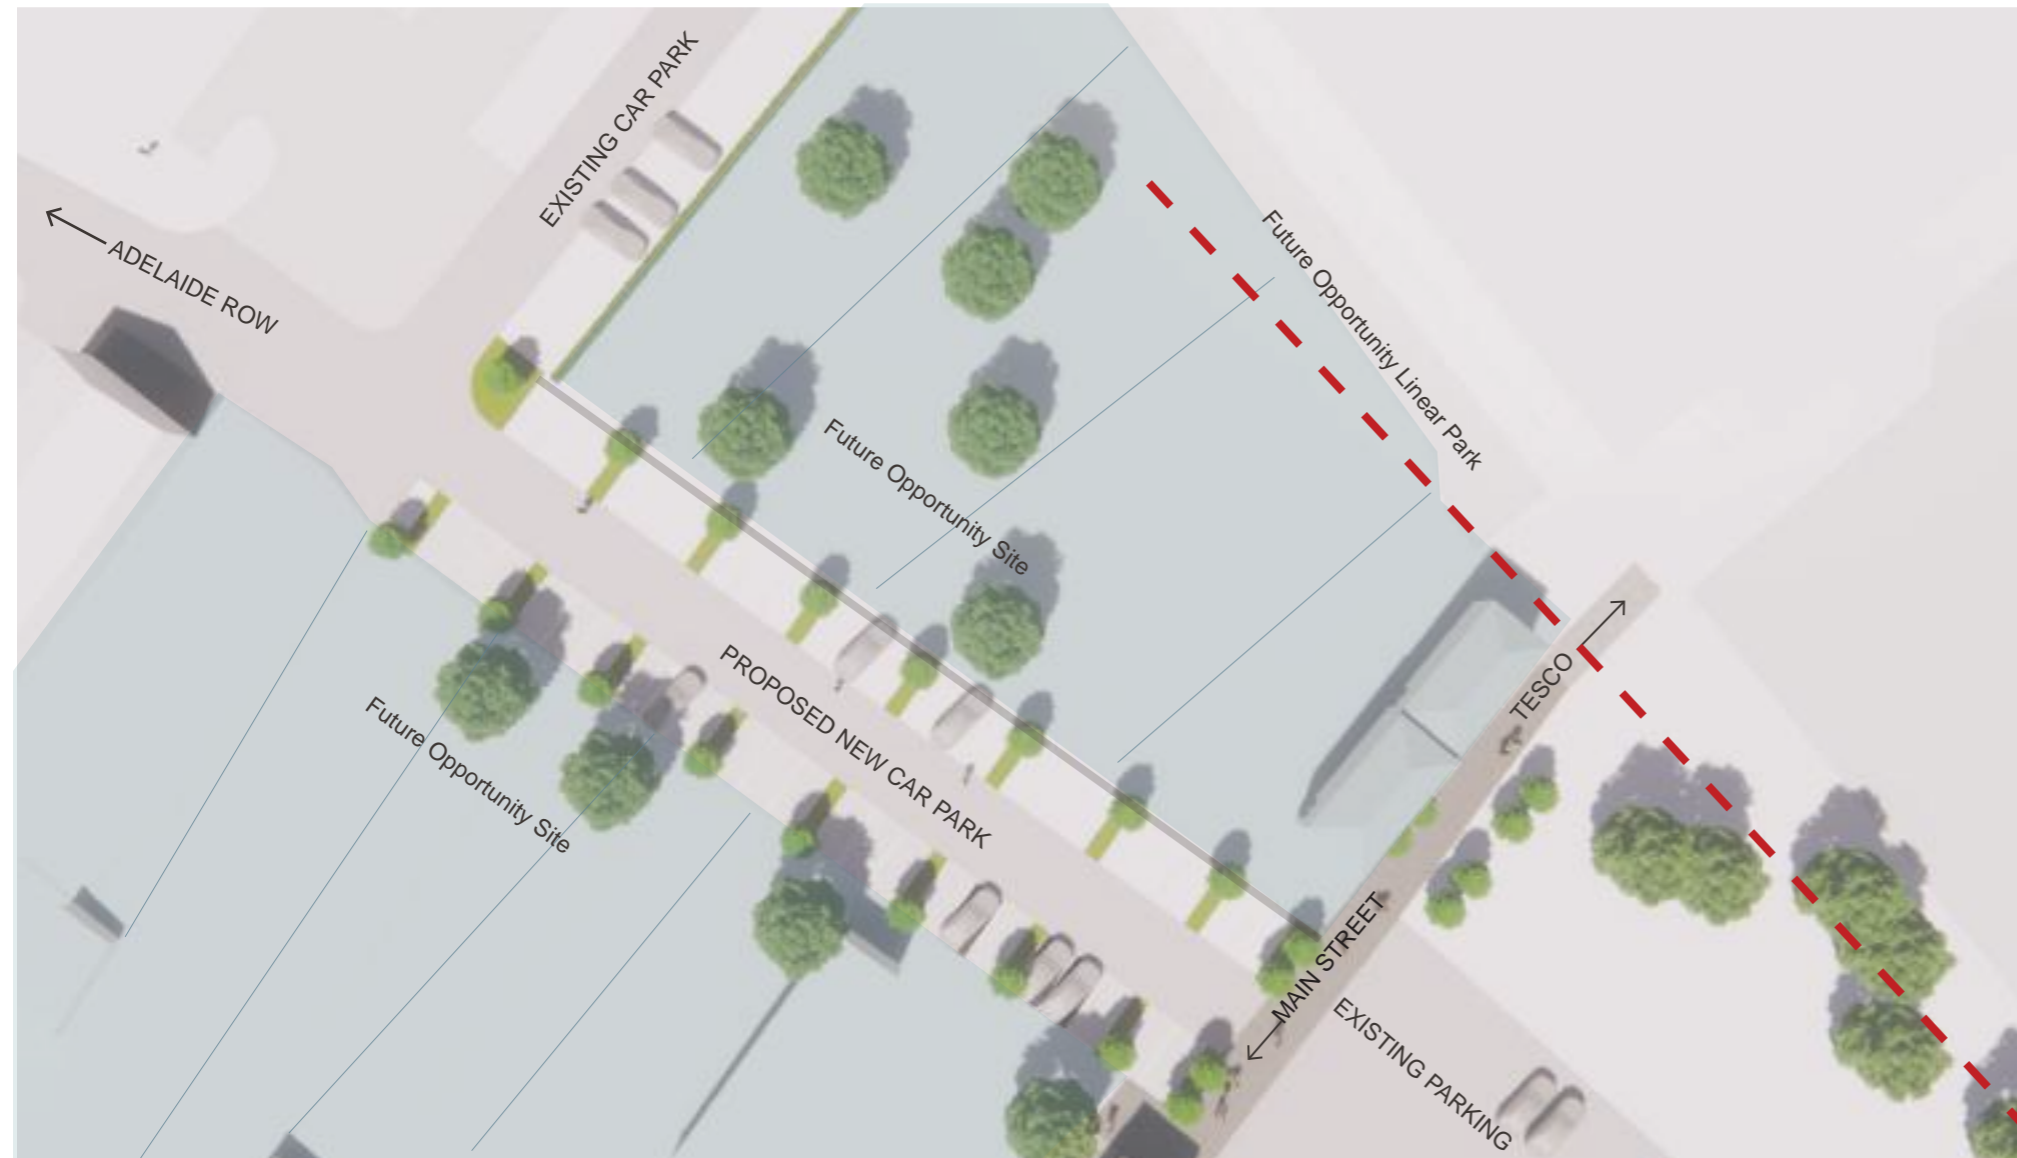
Artistic Impression of Proposed New Car Park - Plan View
